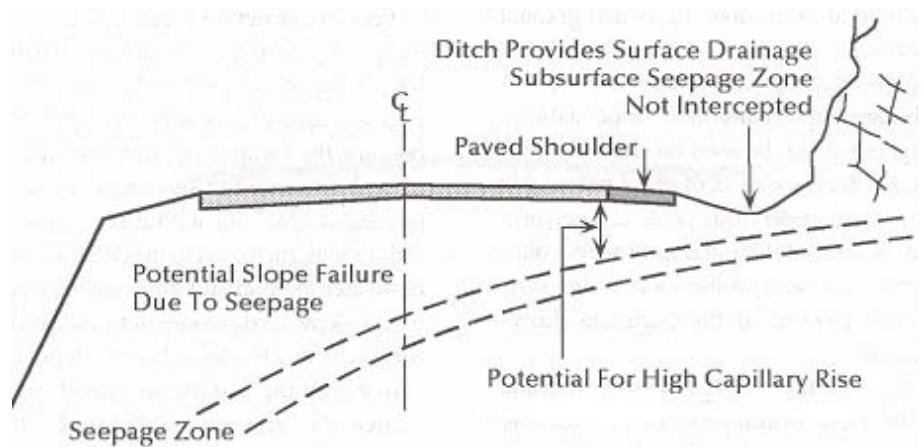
Typical drainage deficiencies associated with cut-and-fill pavement sections¹³
